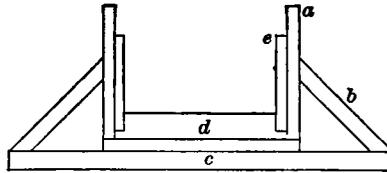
Section of Sluice-box, J. C. Mills land, Burke Co., N. C. Scale, $\frac{1}{4}$ inch=1 foot. *a*, $1\frac{1}{2}$ -inch surfaced pine plank (sides and bottom); *b*, 2x4-inch brace; *c*, 2x4-inch sill; *d*, 1x4-inch riffle; *e*, 1x8-inch sand-board.
